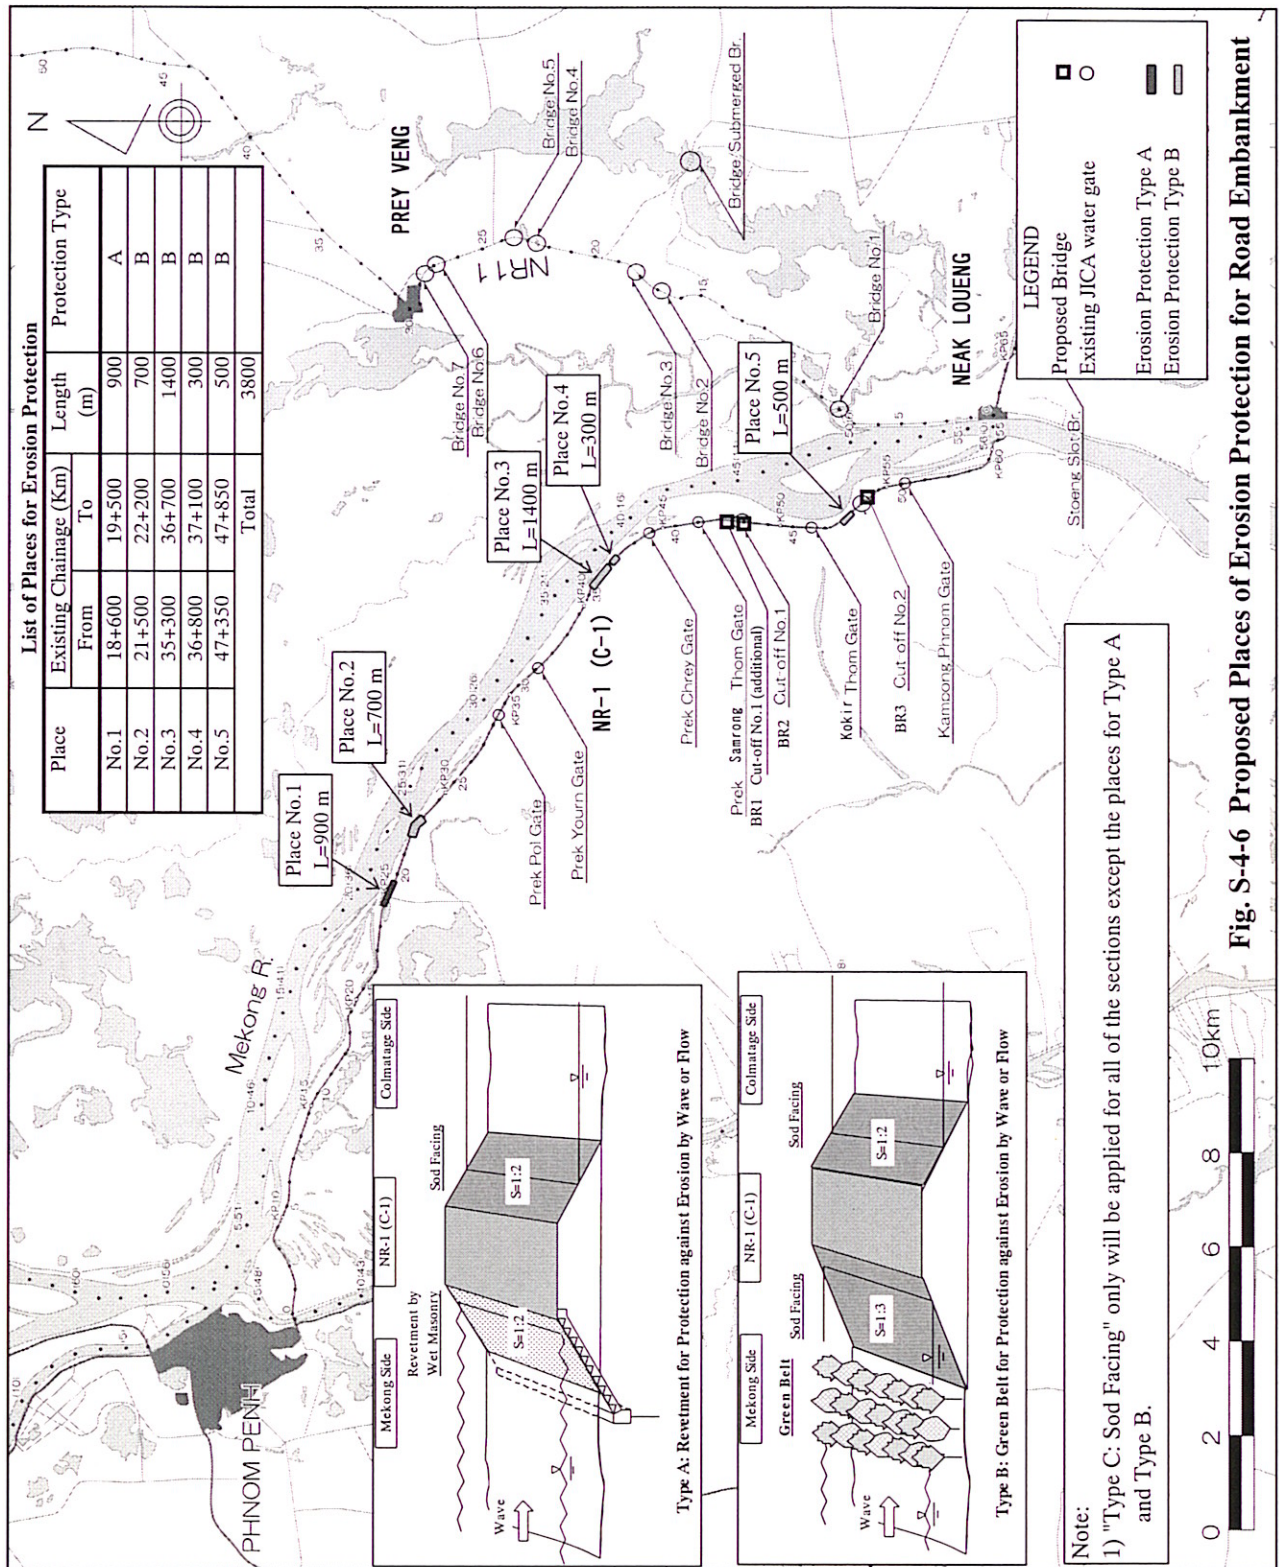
Proposed Places of Erosion Protection for Road Embankment
